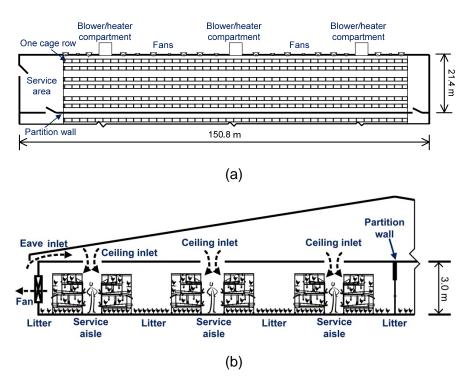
Schematic layout (a) and cross-section (b) views of the aviary laying-hen house.
